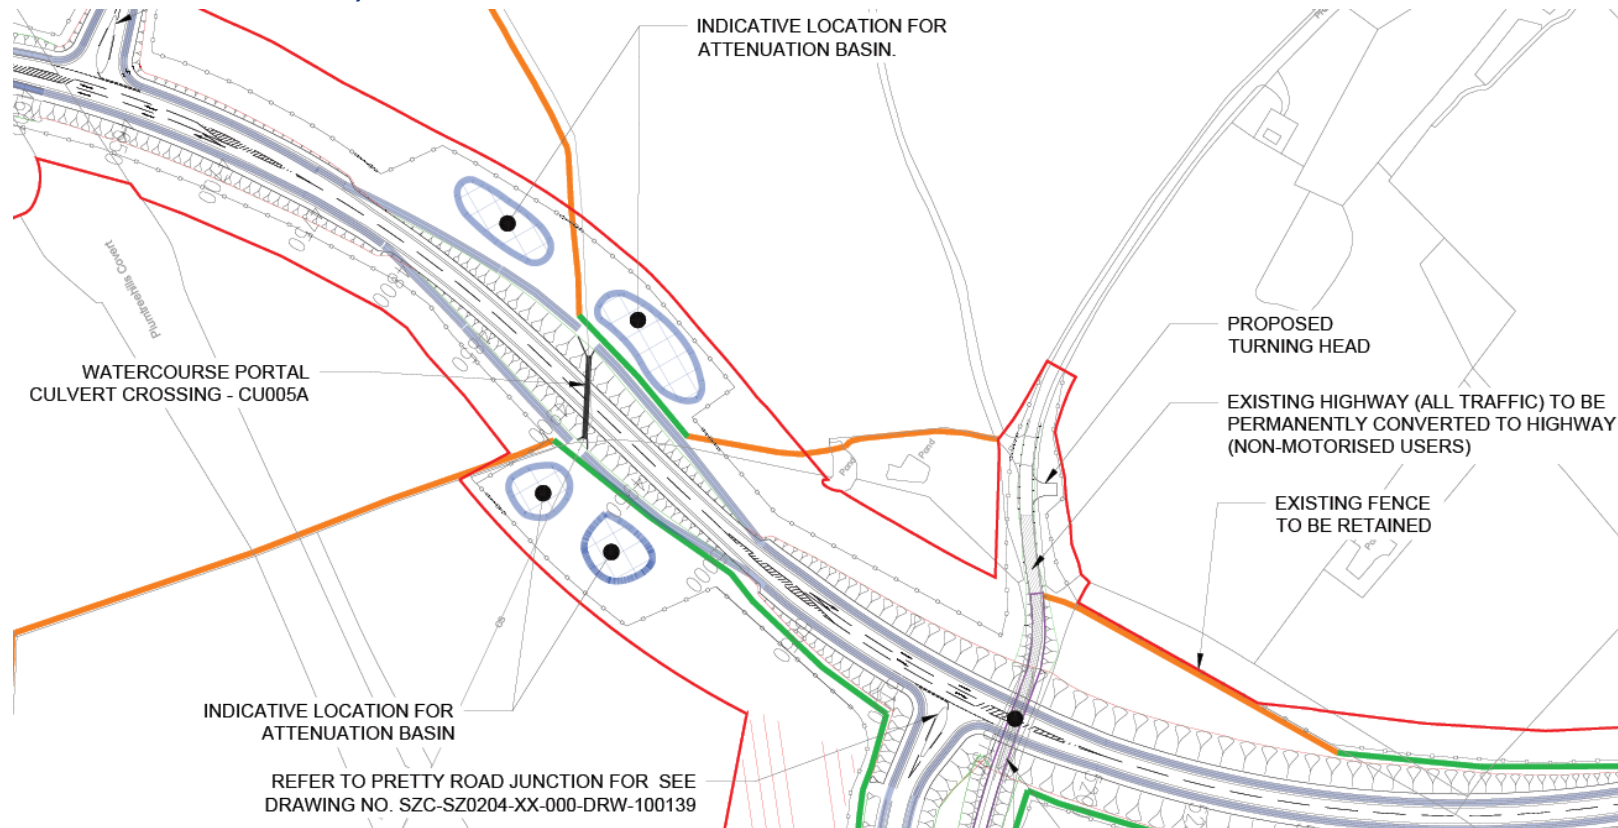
Indicative location of the attenuation basins at crossing 6 (Extract from drawing no. SZC-SZ0204-XX-000-DRW-100059 Rev 02 Sheet 4)
